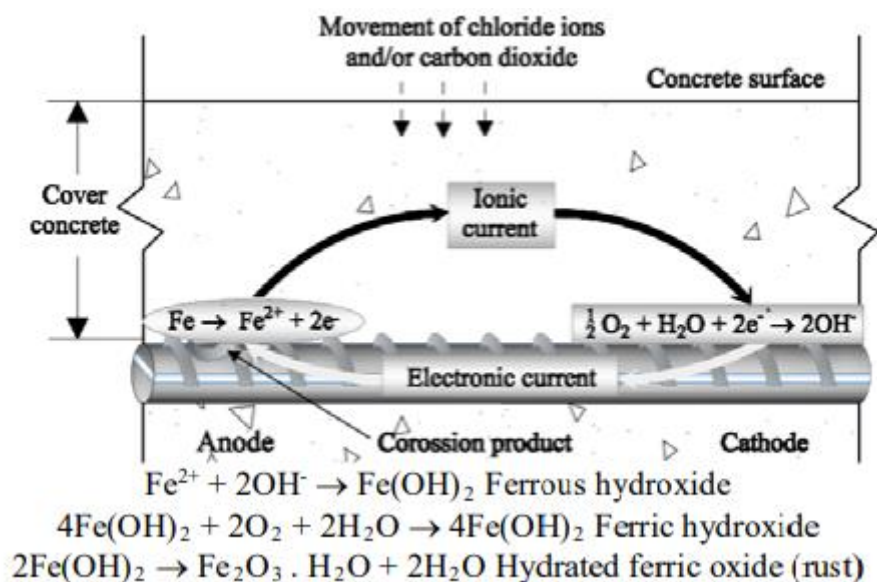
Component of corrosion reaction on rebar in concrete. [12]
